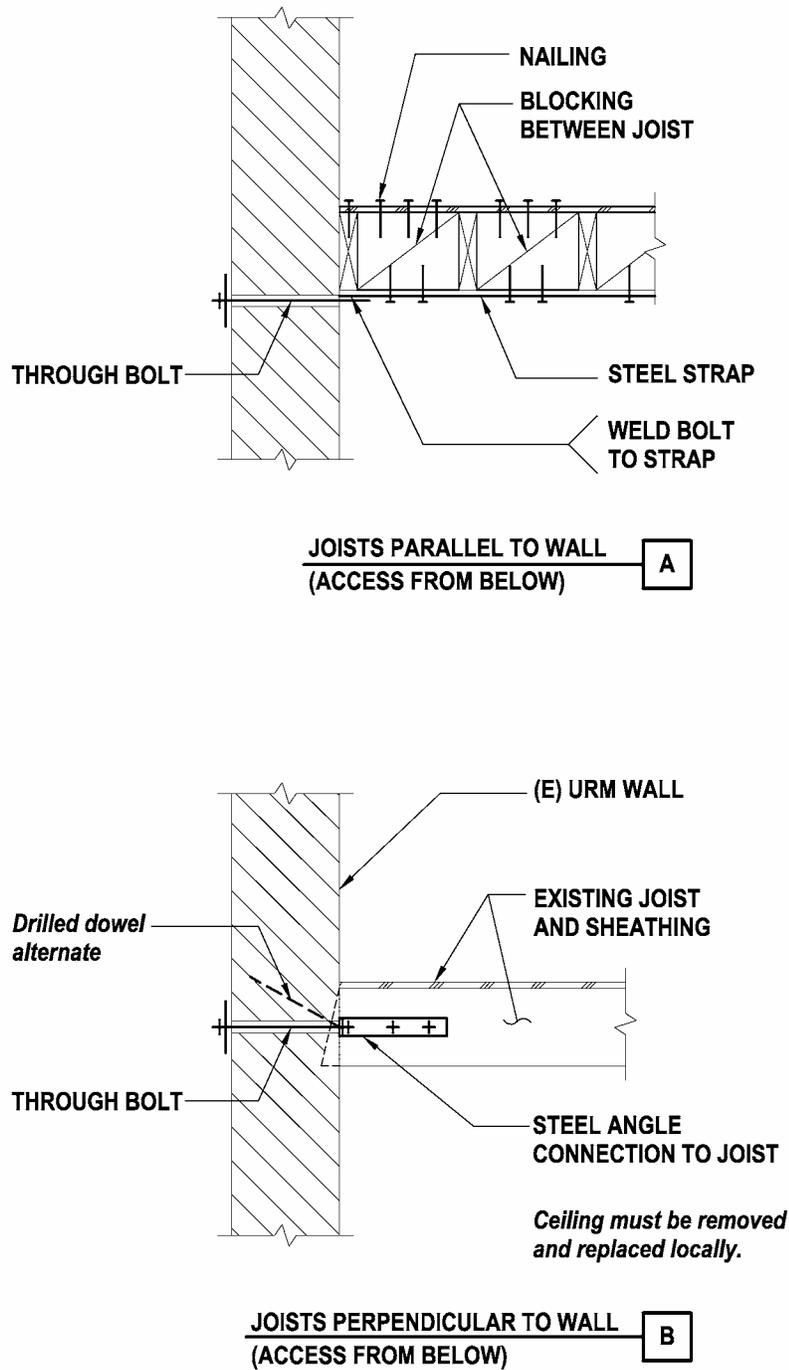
Tension Anchors Installed from Below the Floor
